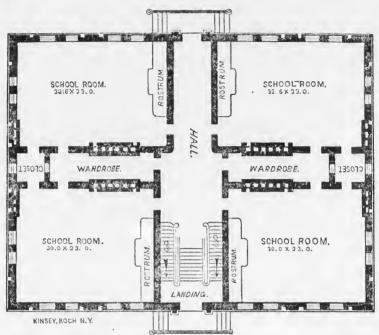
Plan of Ground and First Floors, adapted to Figs. 202 and 203.
